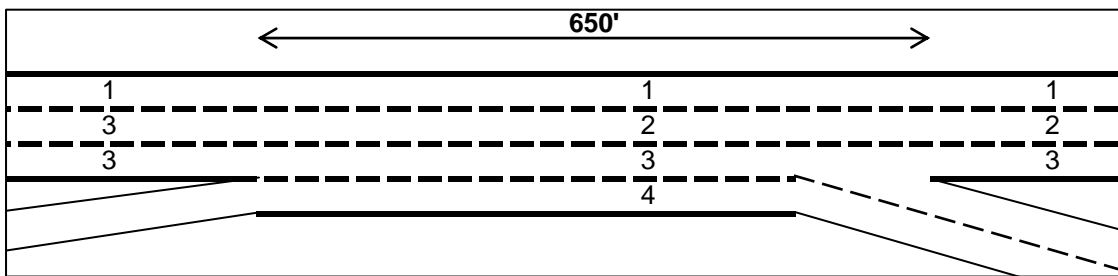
Site 2: I-405EB; 6th Avenue to 12th Avenue, Portland, OR
